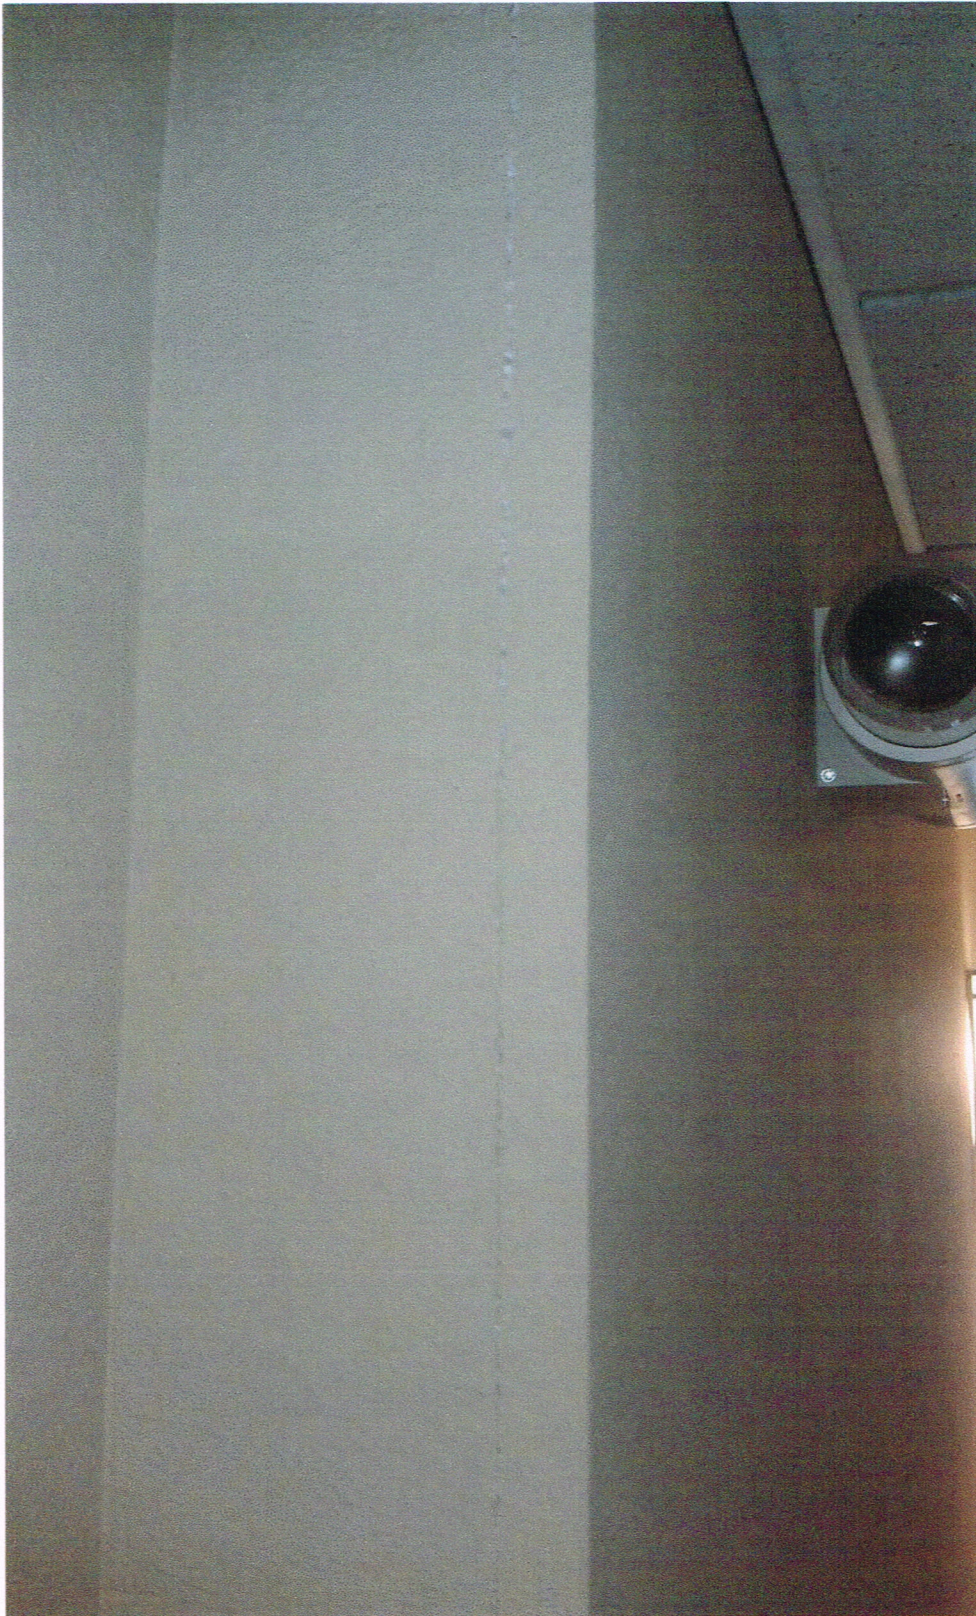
Hallway gypsum wallboard cracking near room 203.
